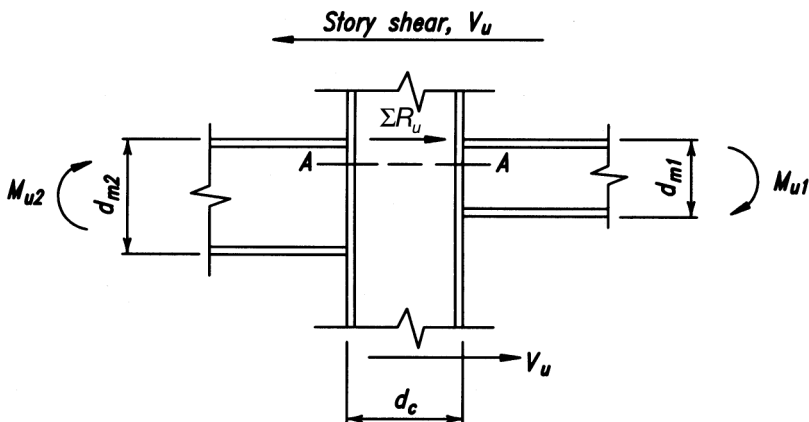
LRFD forces in panel zone (ASD forces are similar).
